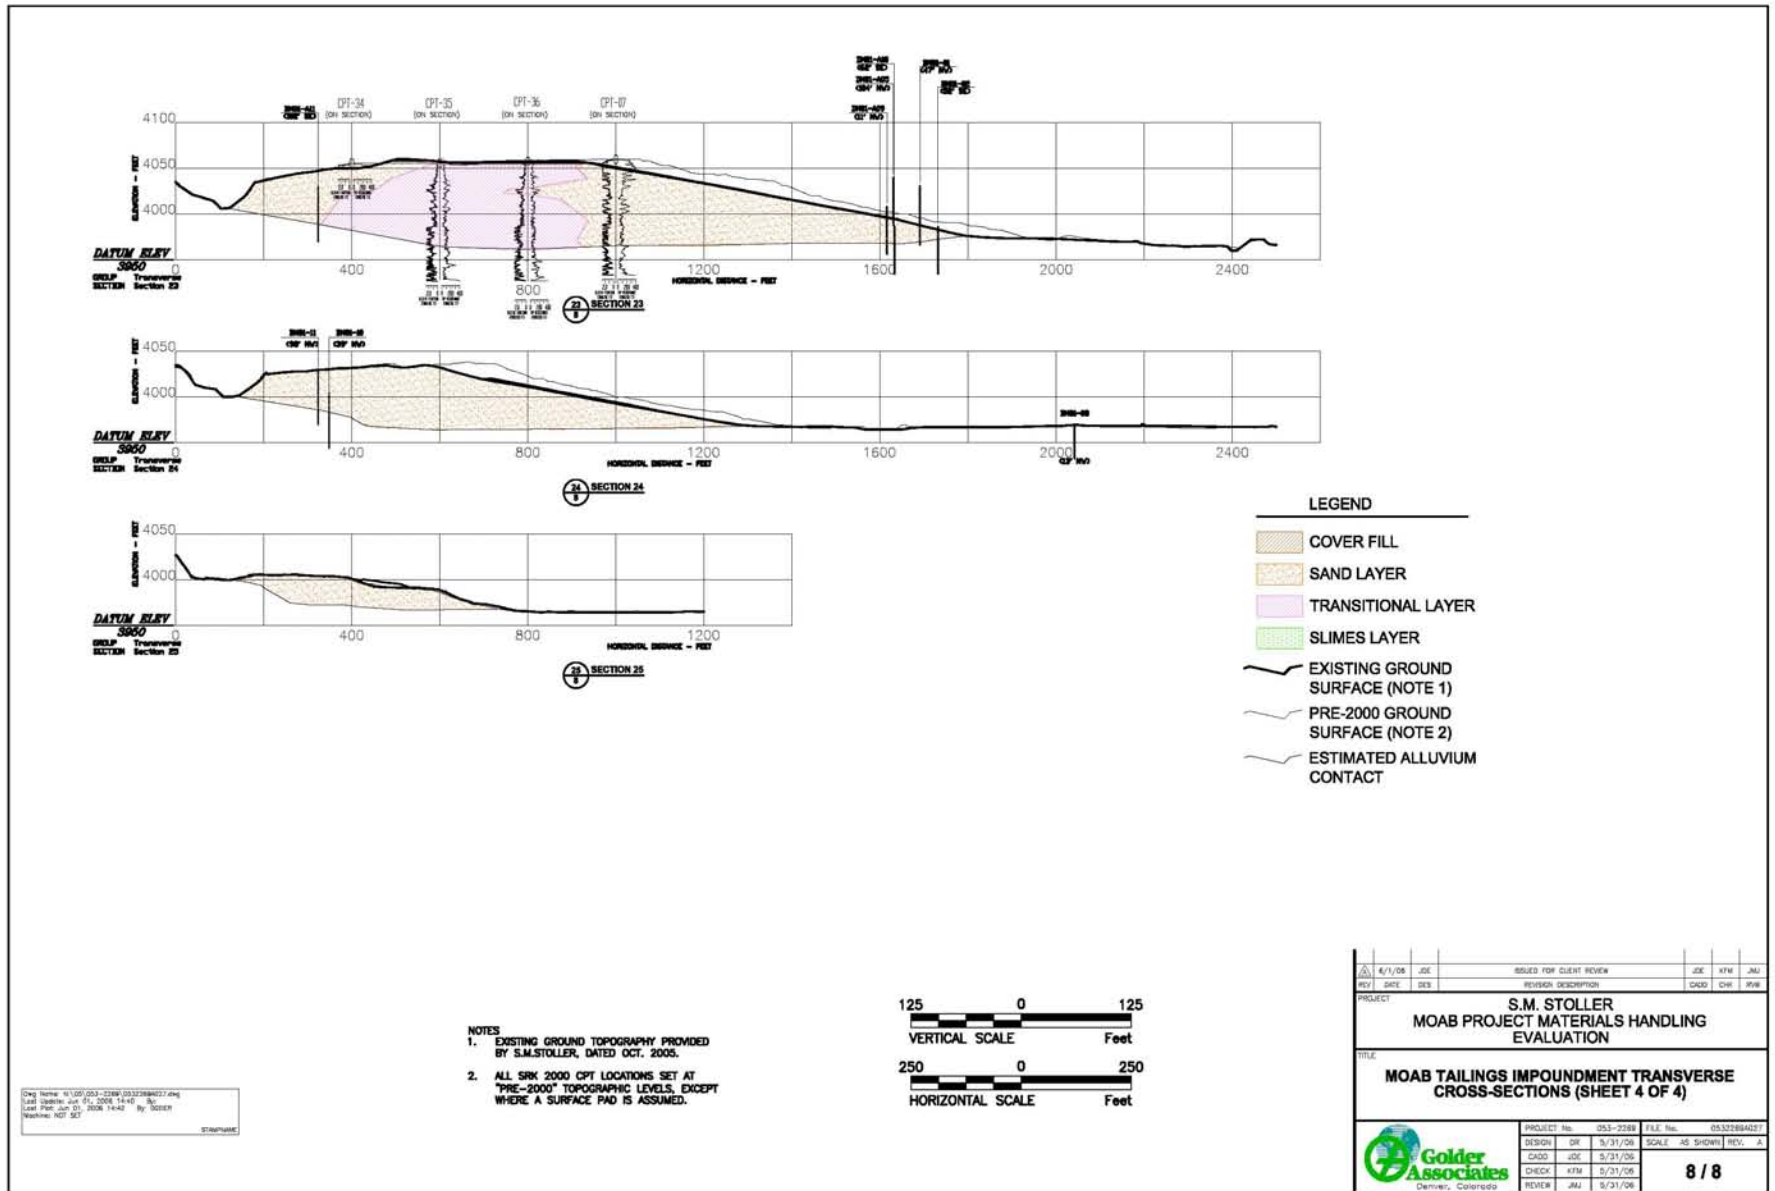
Moab Tailings Impoundment Transverse Cross Sections (Sheet 4 of 4)
